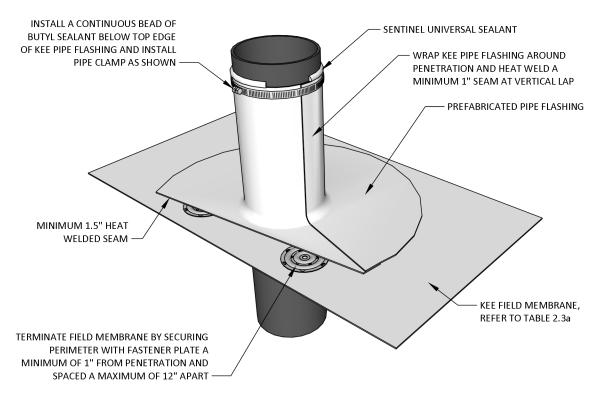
Induction Welded KEE Field Membrane at Penetration With Prefabricated Pipe Flashing
